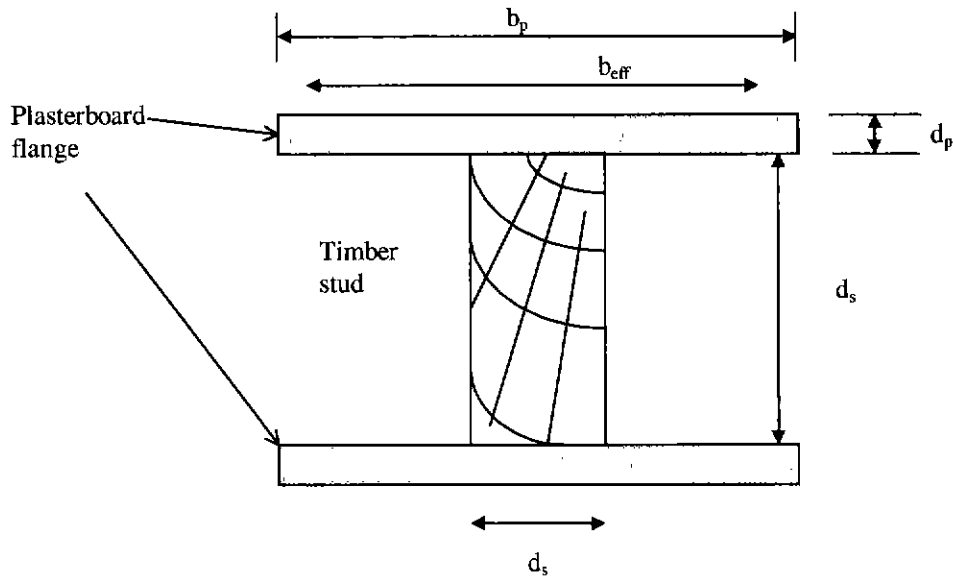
Horizontal Cross Section of Representative Part of Wall
